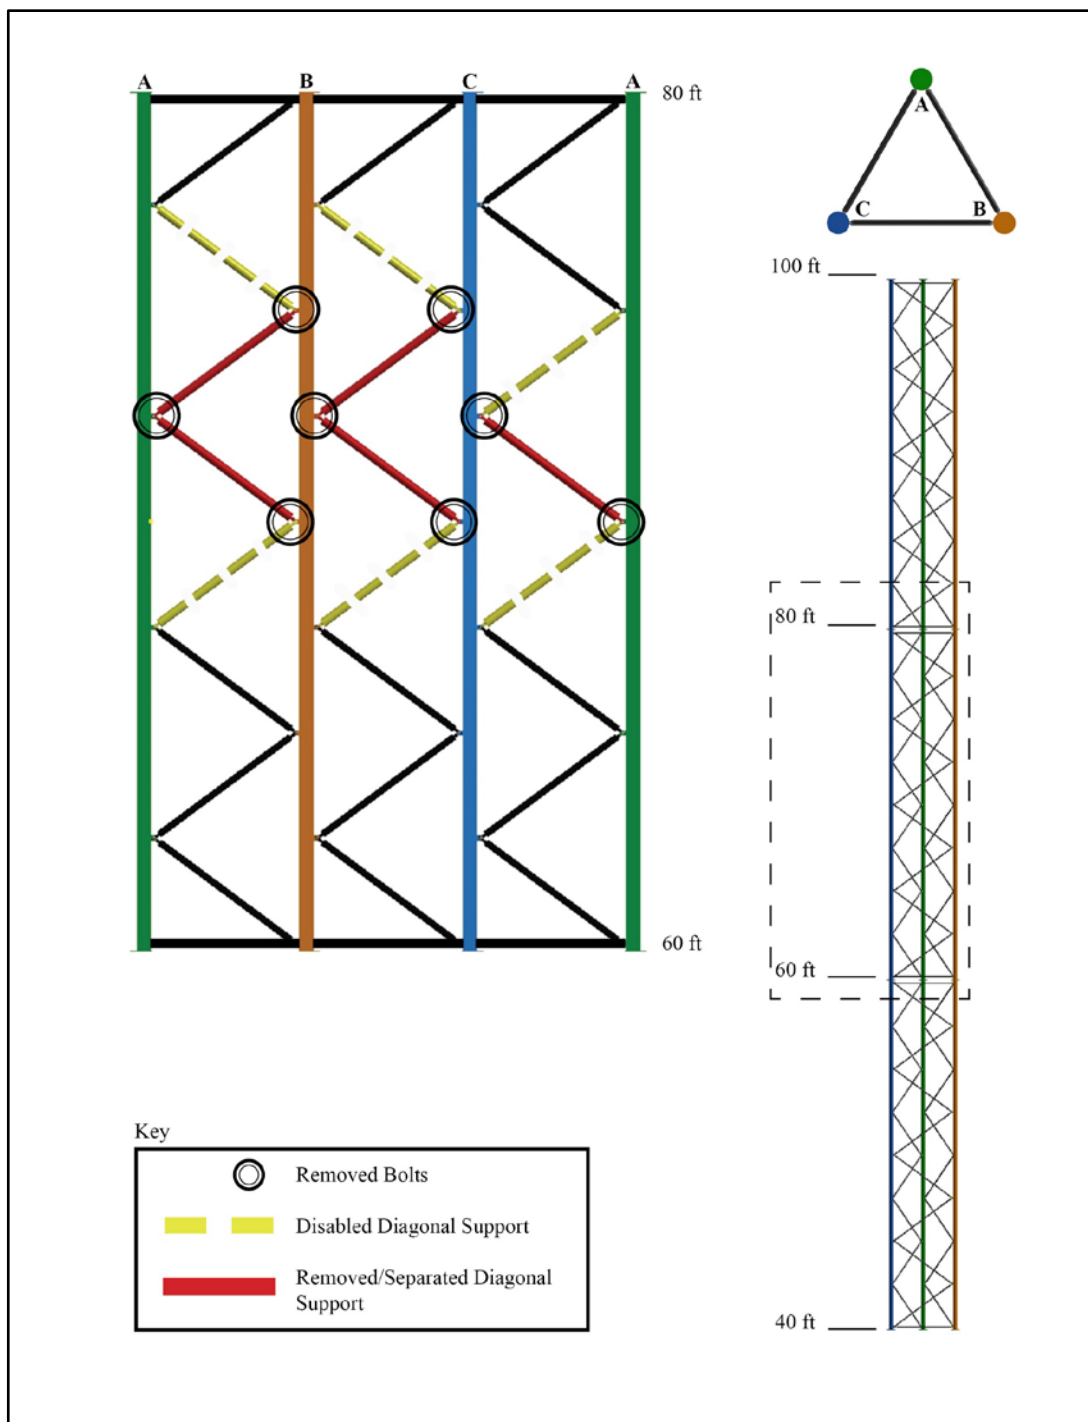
Section of Tower 1 shown with removed bolts and diagonal support braces.
